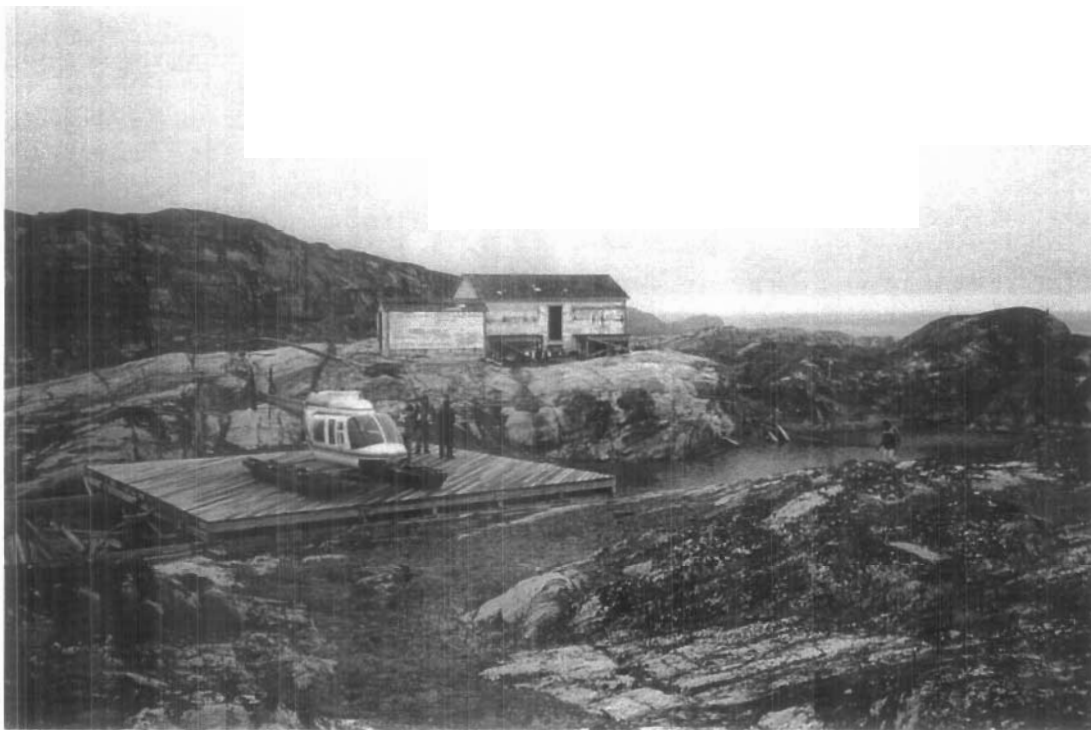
Facing east at helipad on concrete foundation. Winch shed and main house in background.
